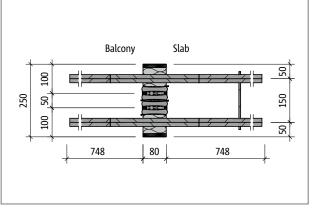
Schöck Isokorb® T type Q-E-VV7: Product layout
